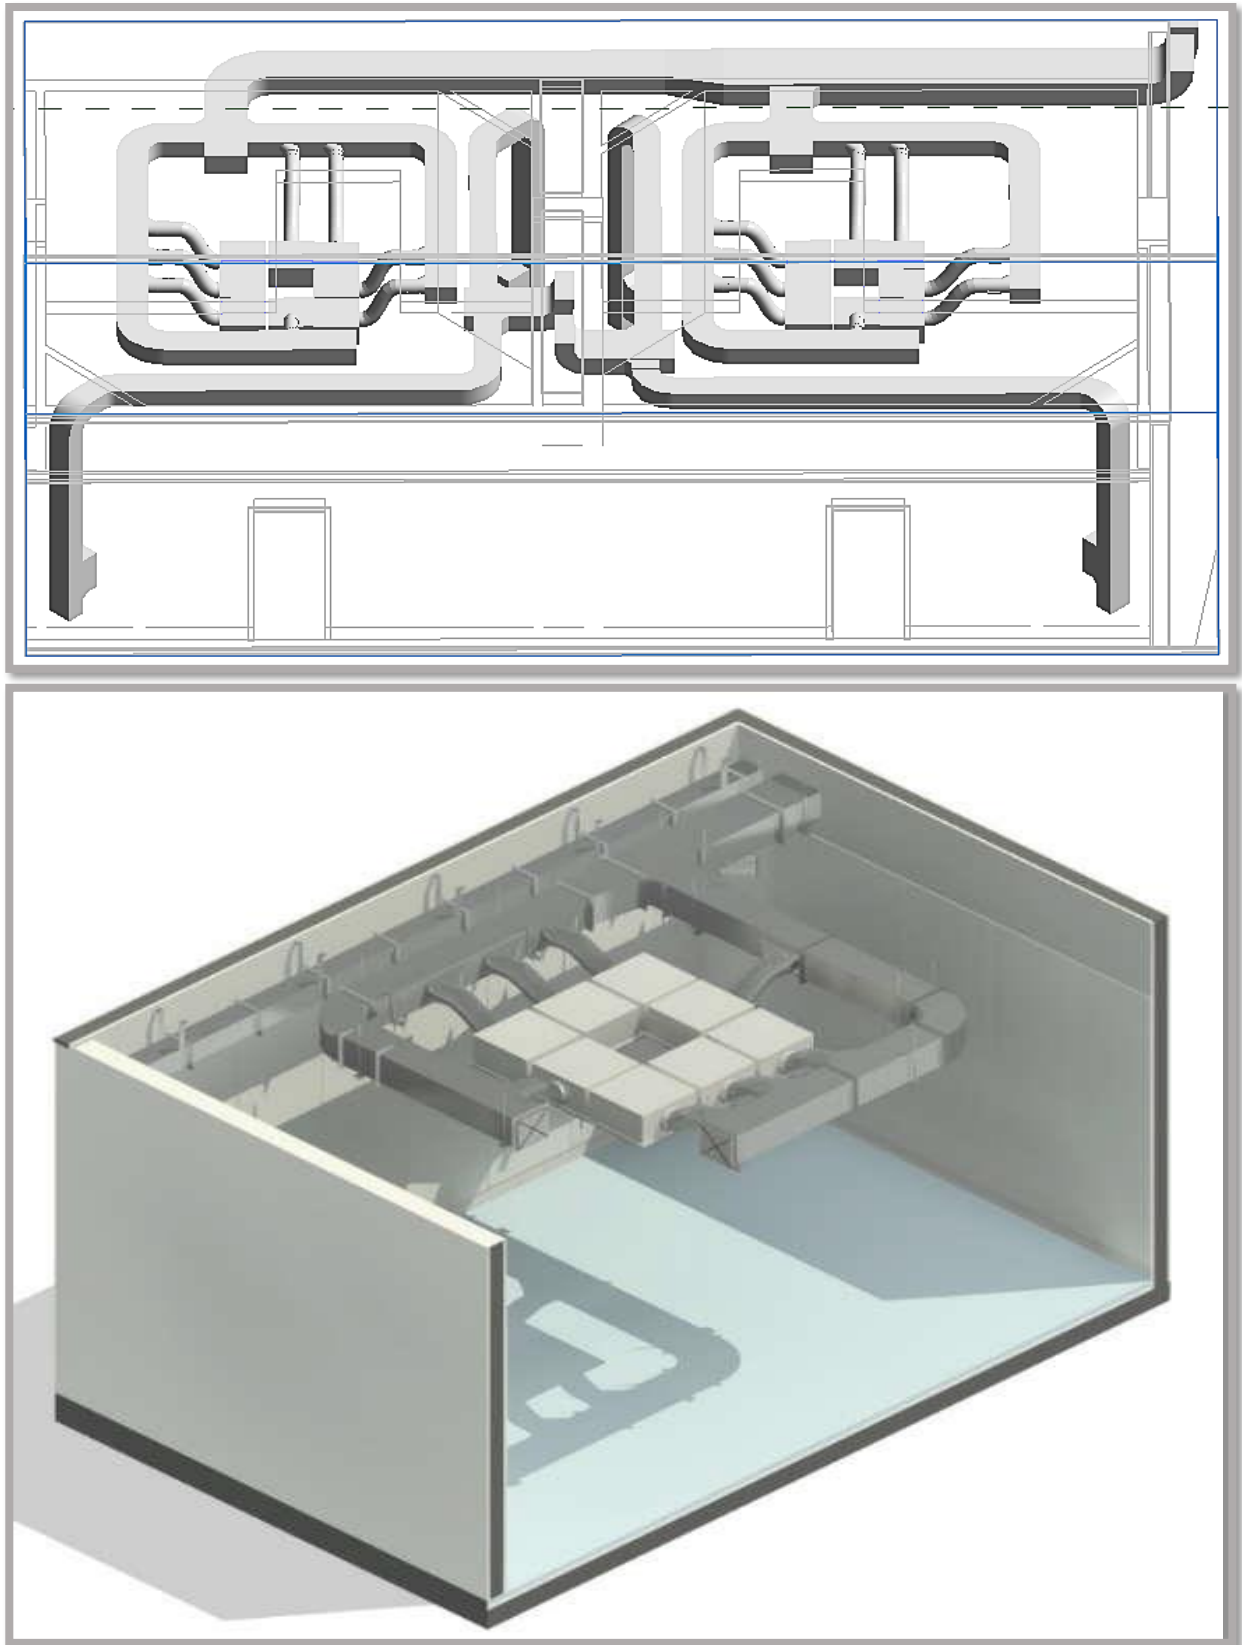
Perforated ceiling diffuser and Exhaust system in operation room
